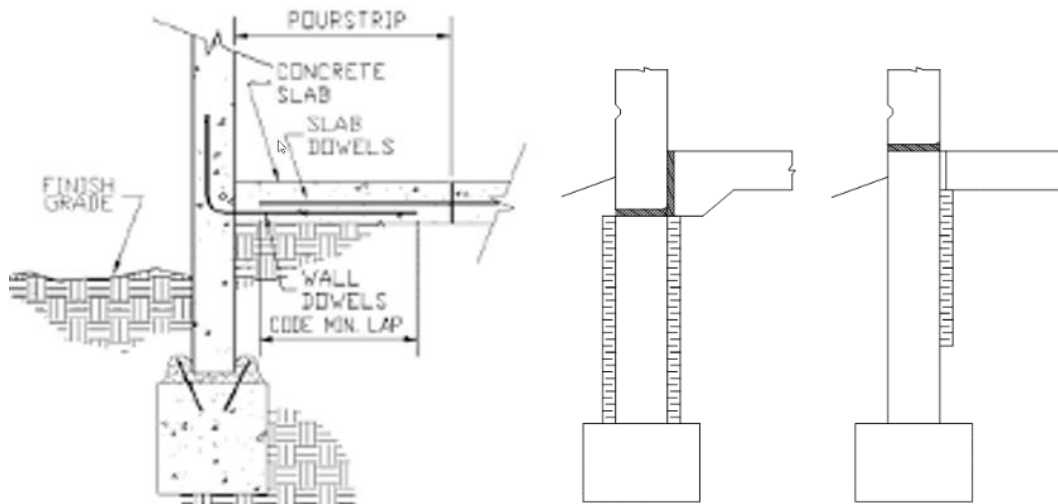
, Pour strip (left); Avoid by using one of the foundation walls at right
